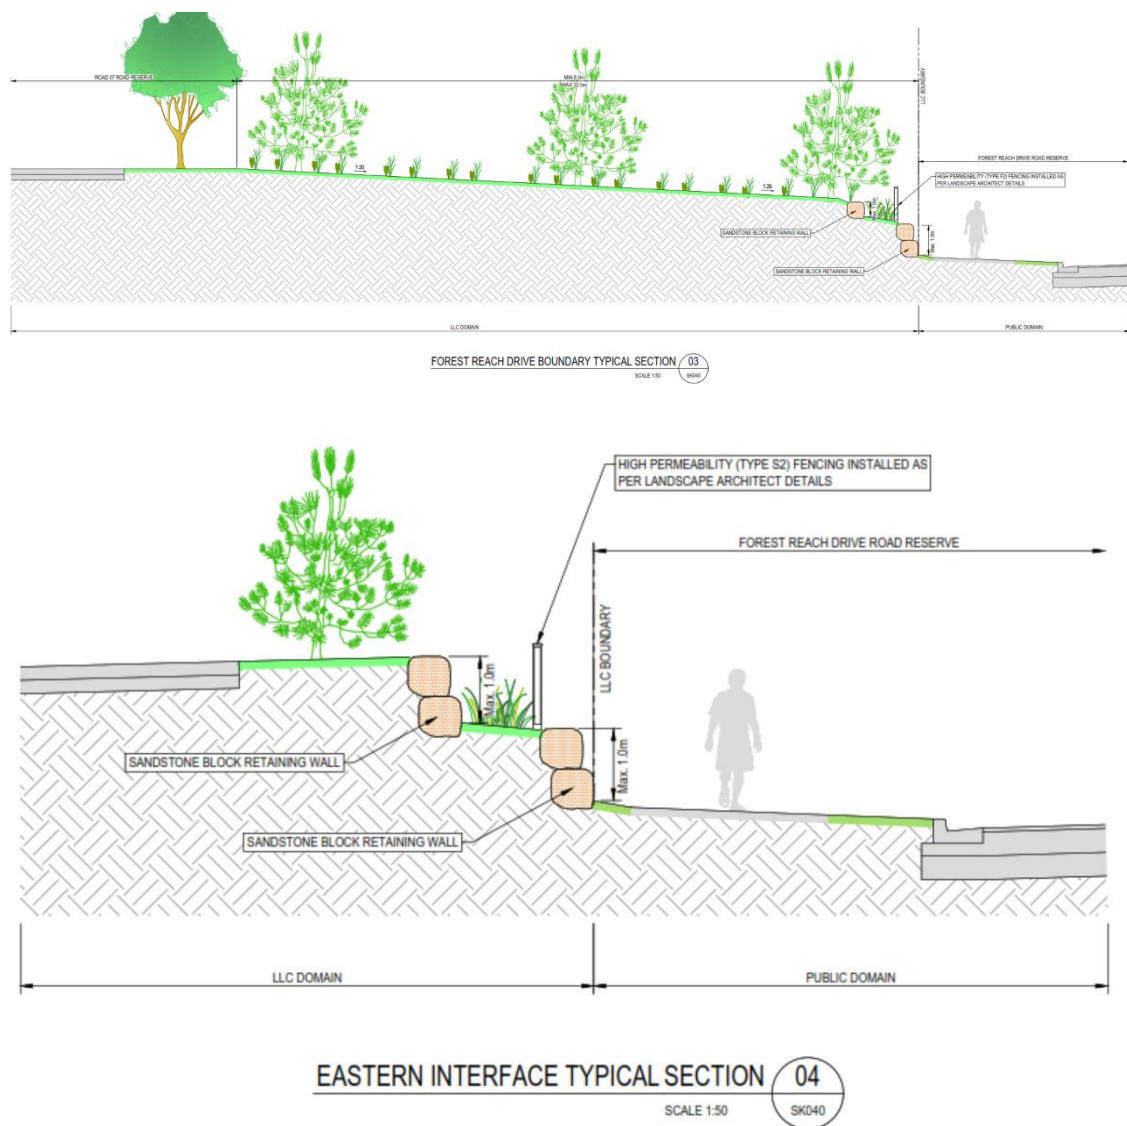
Cross section of 2m retaining wall with Forest Drive interface
